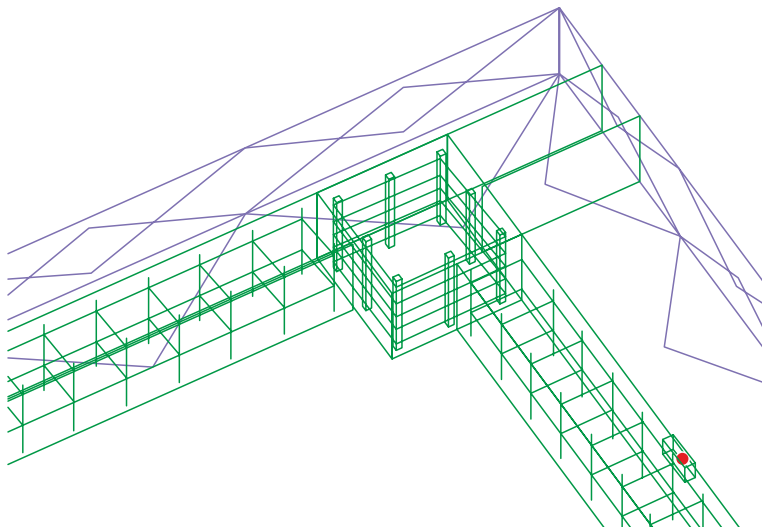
Reinforcement in the post, top and left wall with absorption conditions
